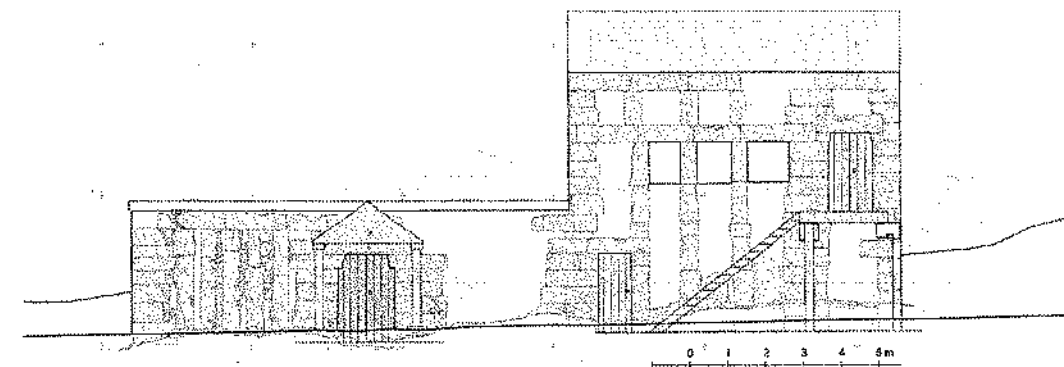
Keloşk Kale, Building 1 (scale 1:200).
